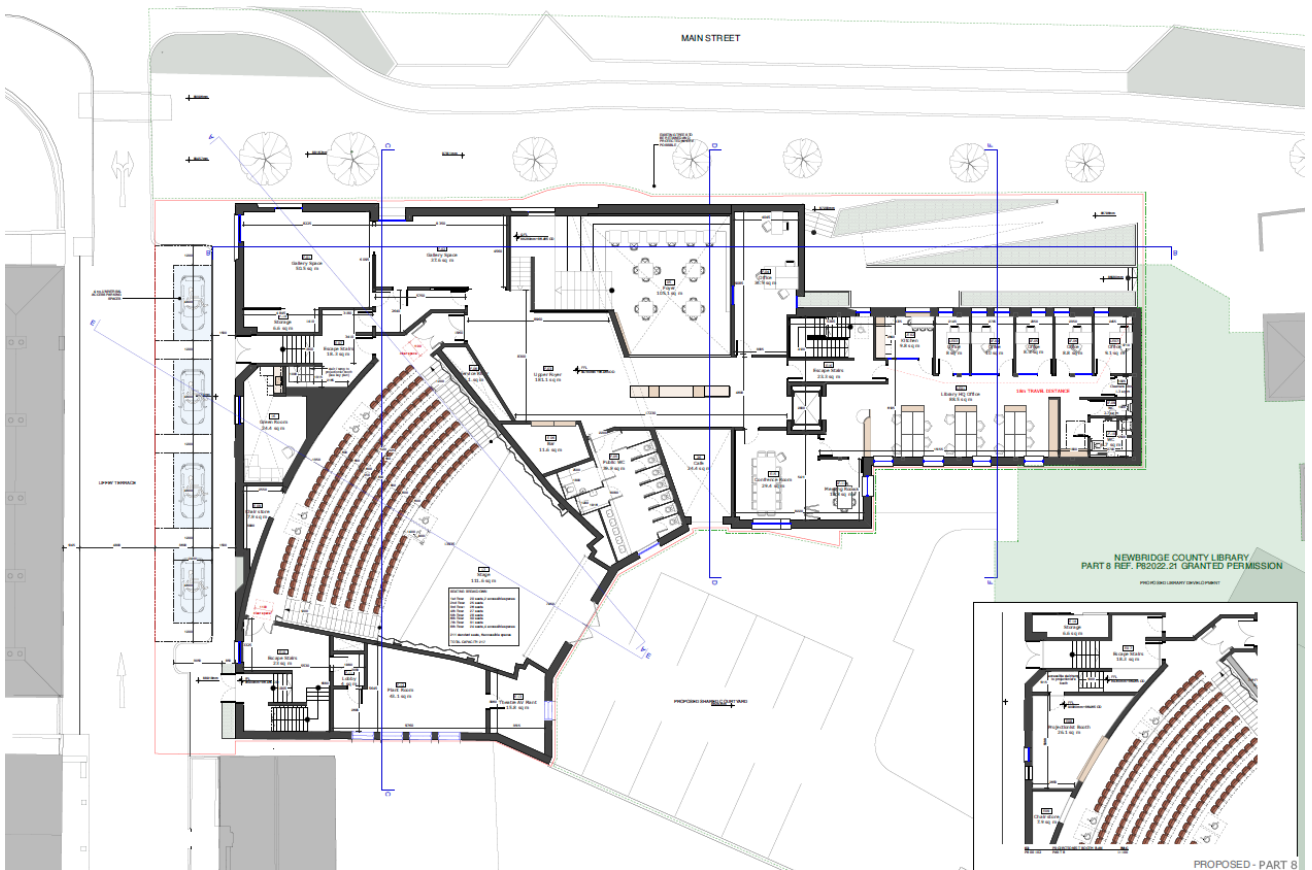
Proposed First Floor Plan (Source: Studio Red Architects)
